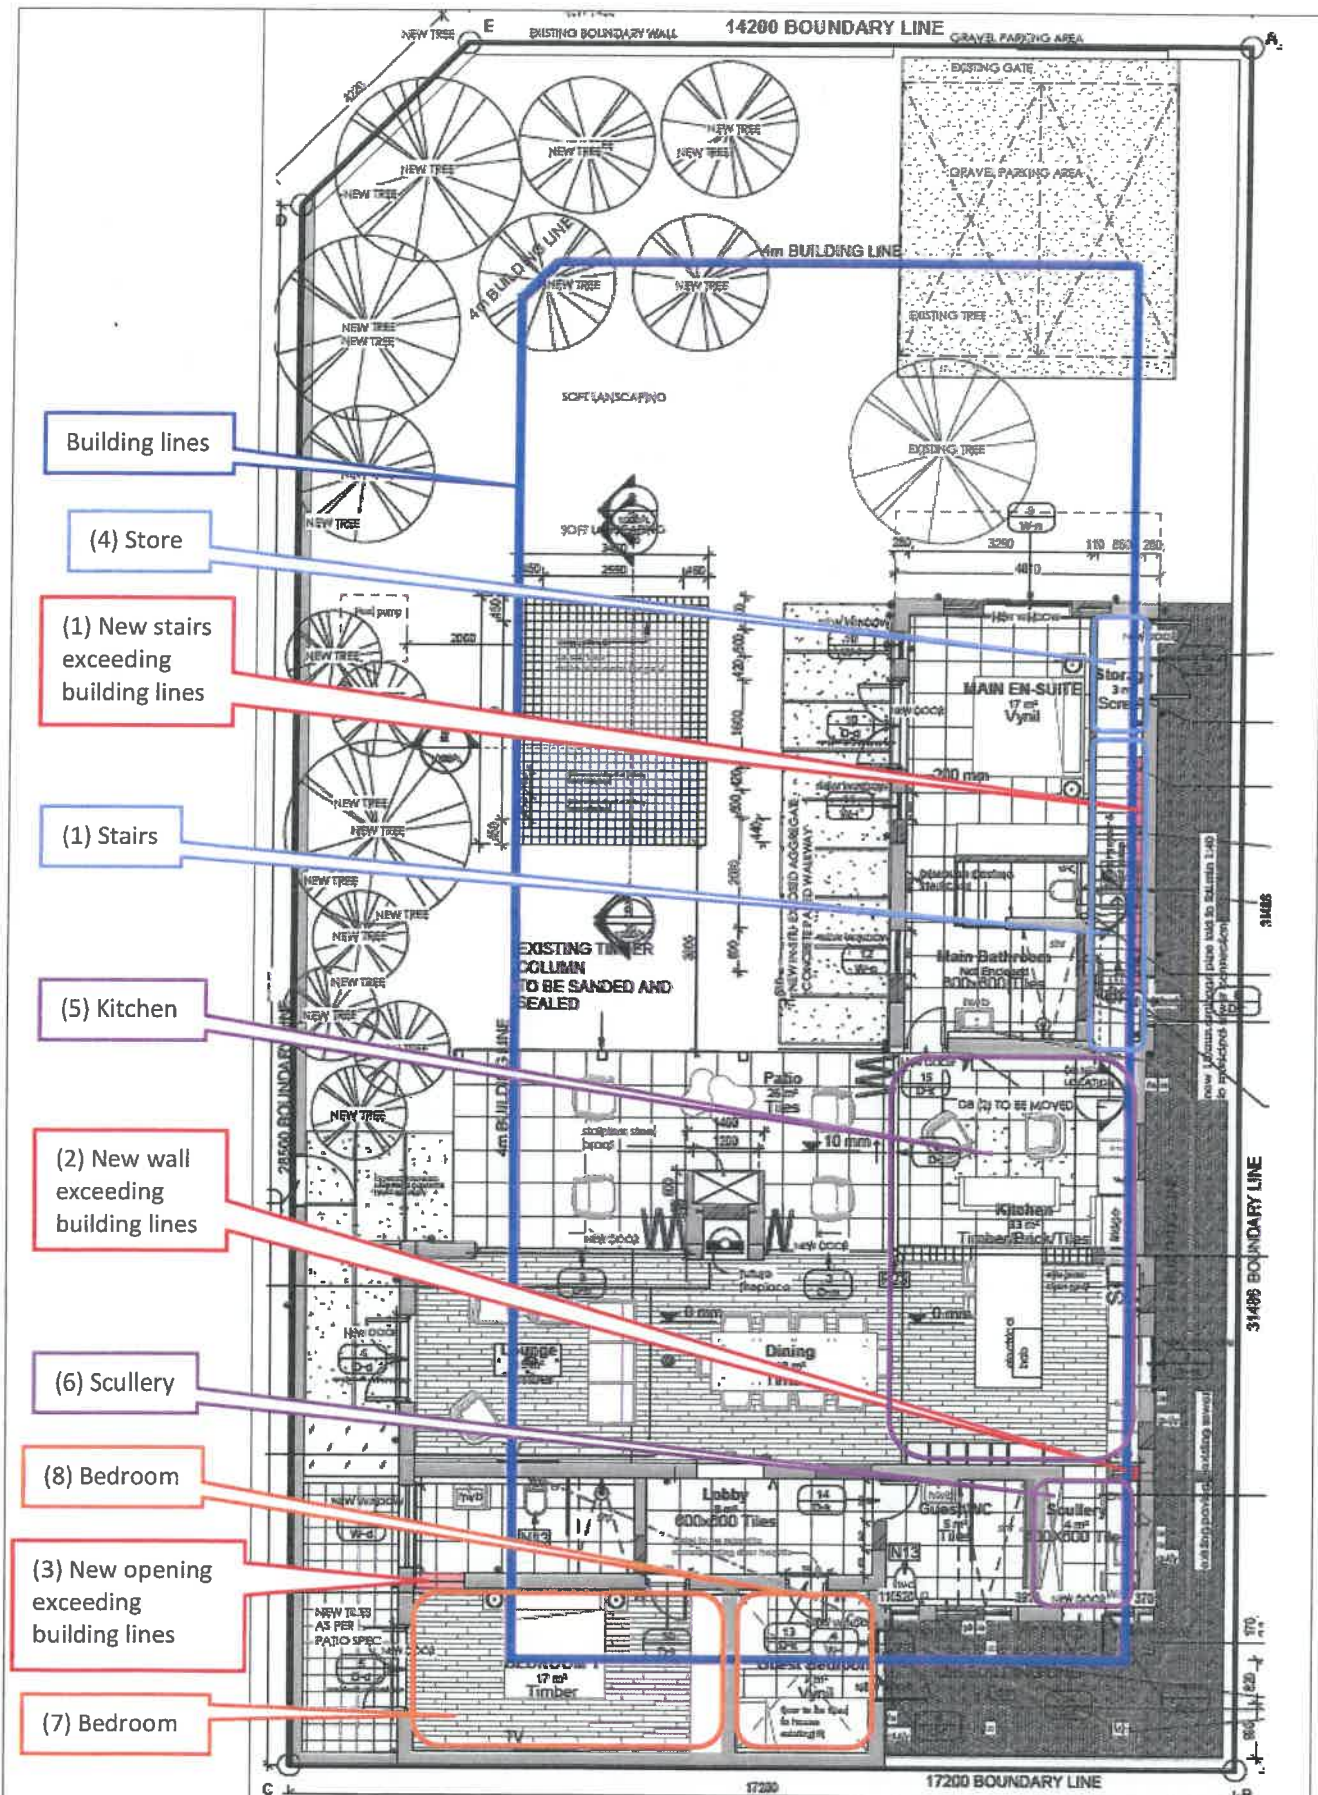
Development Proposal illustrating internal changes exceeding building lines
